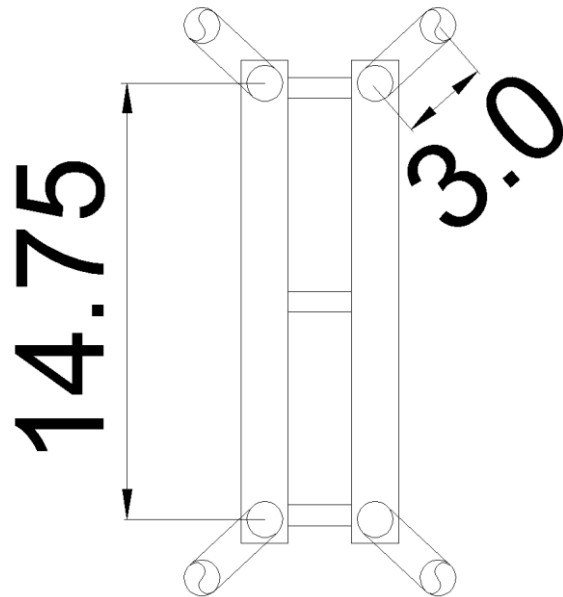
Typical Trestle Anchor Bent (dimensions in meters)
